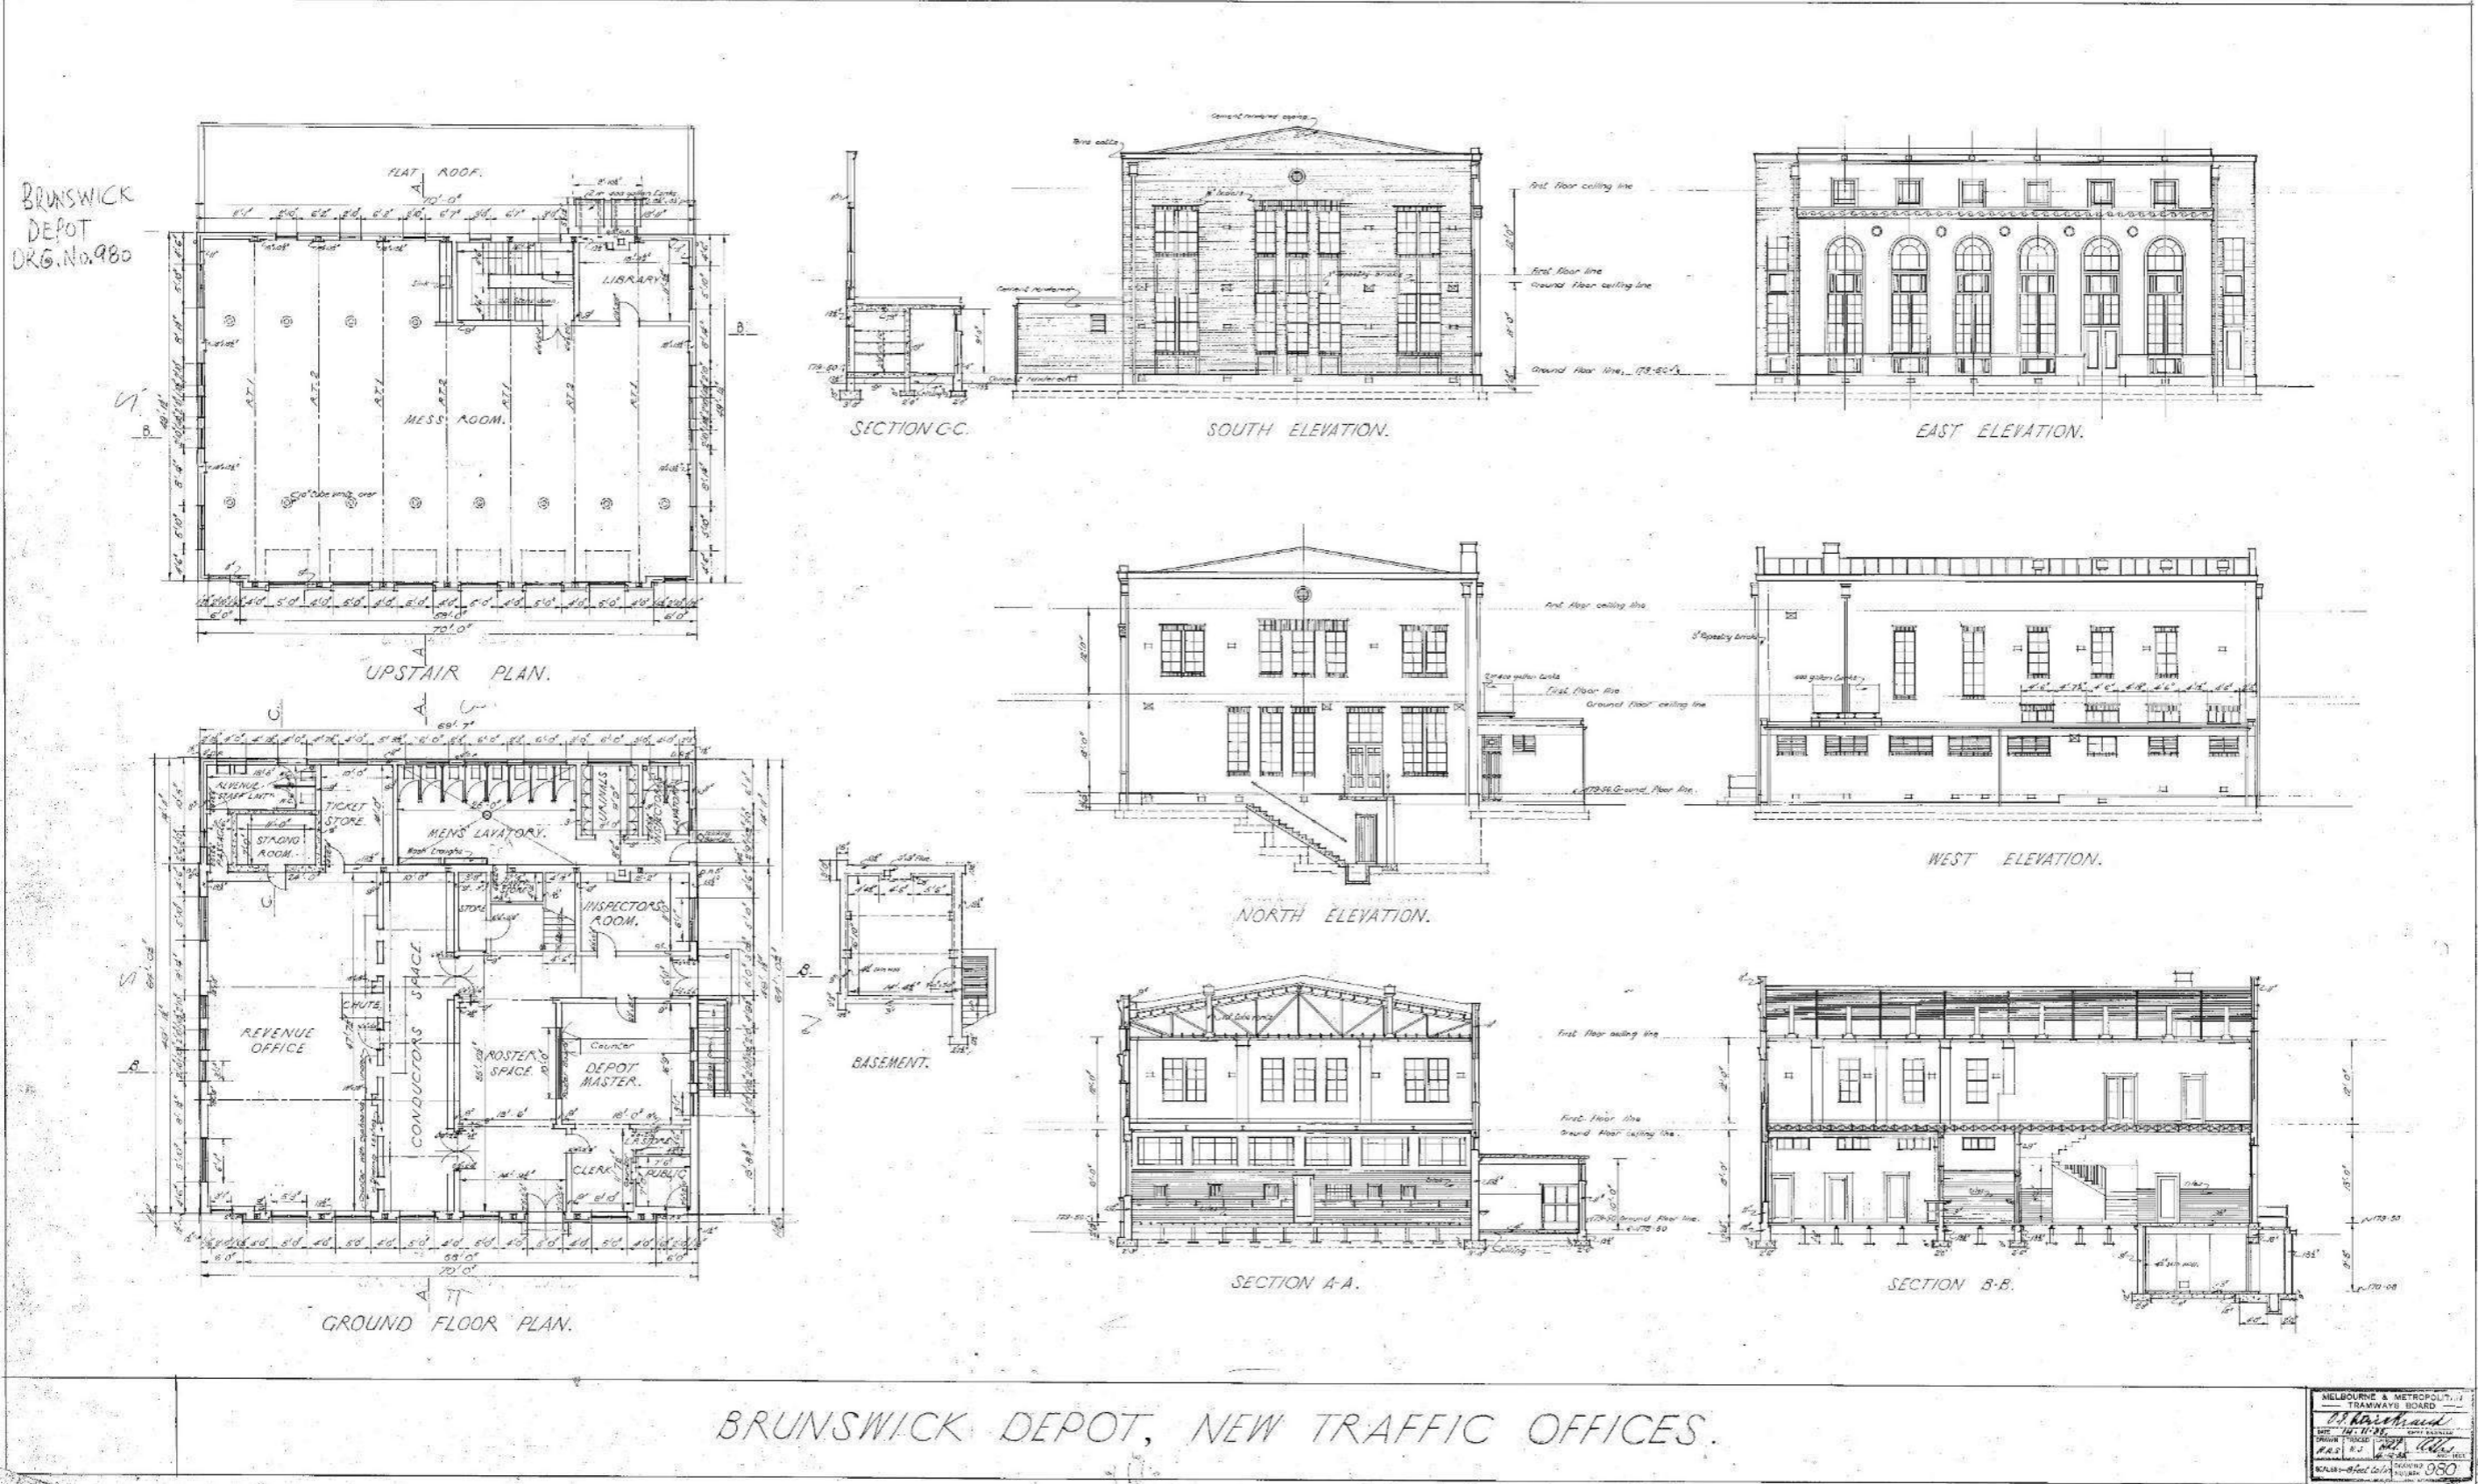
MMTB's 1935 plan of the Traffic and Revenue office building, showing the basement, ground and first floor floorplans, along with building's the north, south, east and west exterior elevations, and two interior sections
